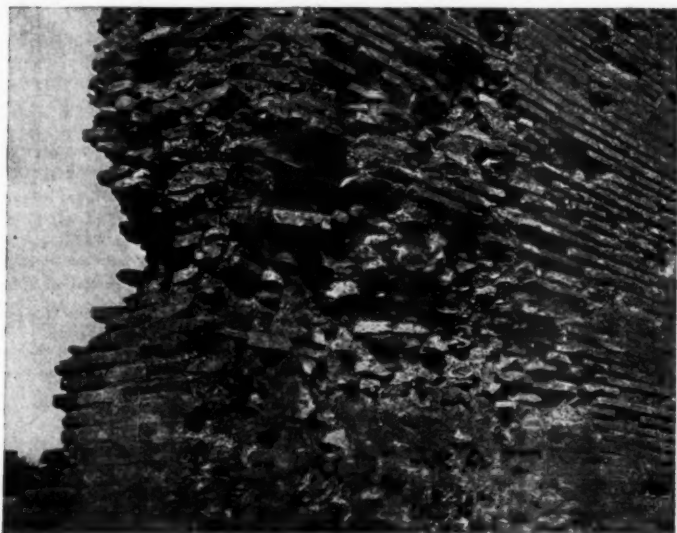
A REFACED WALL.<sup>1</sup>
